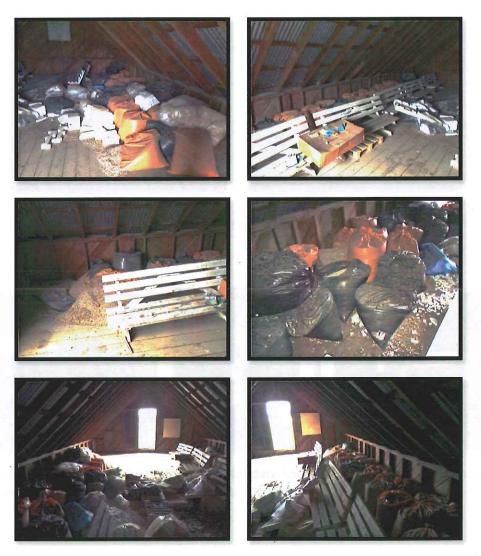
Building 50 – Attic space: asbestos-containing vermiculite insulation present in approximately 70 garbage bags as well as scattered throughout the attic – on the floor and on stored items
